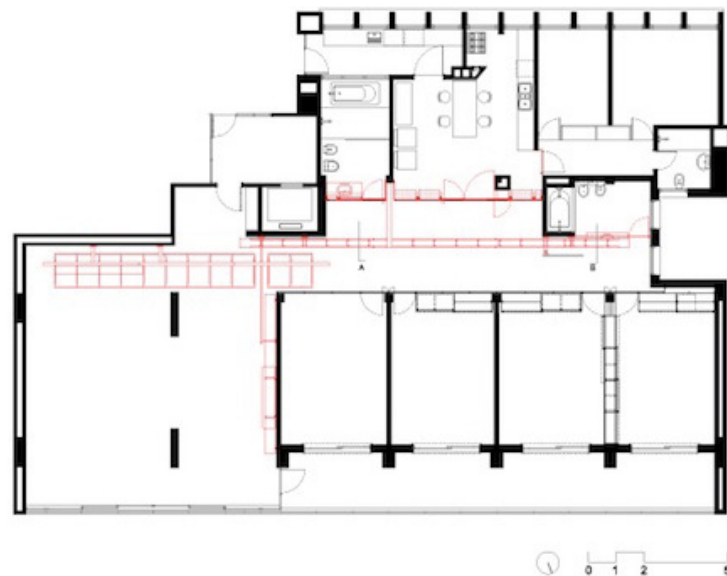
The renovation plan of Andrade Morettin with the equipment.
